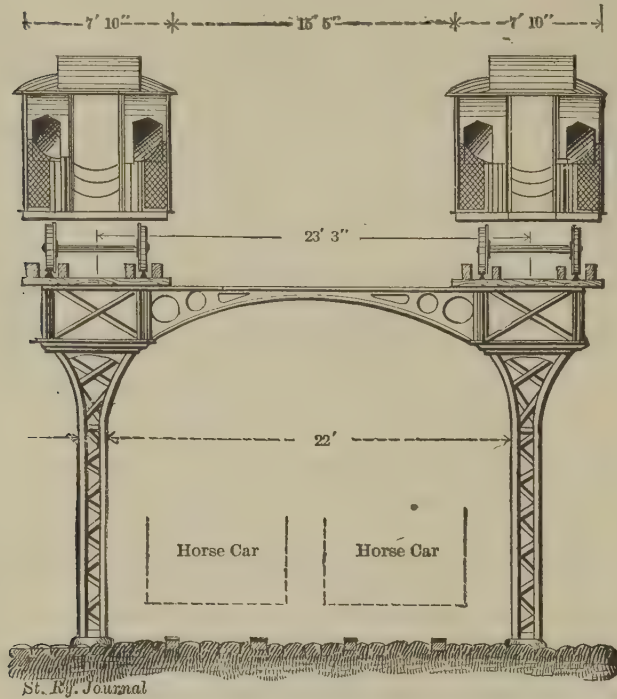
MANHATTAN ELEVATED—THIRD AVENUE.
